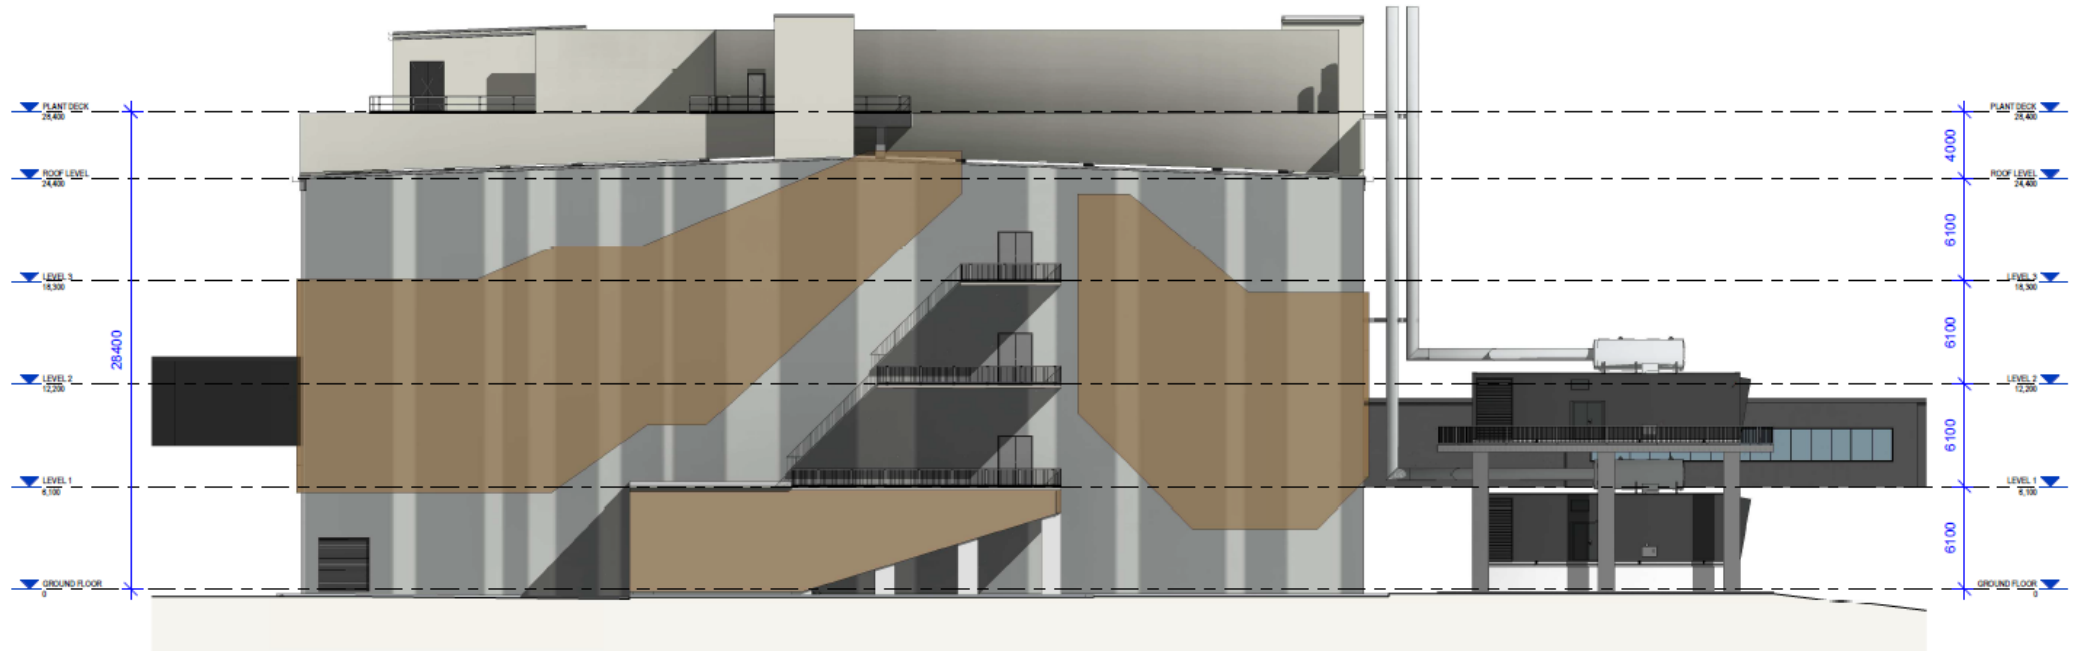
Amended Southern Façade Elevation showing Feature Screens
